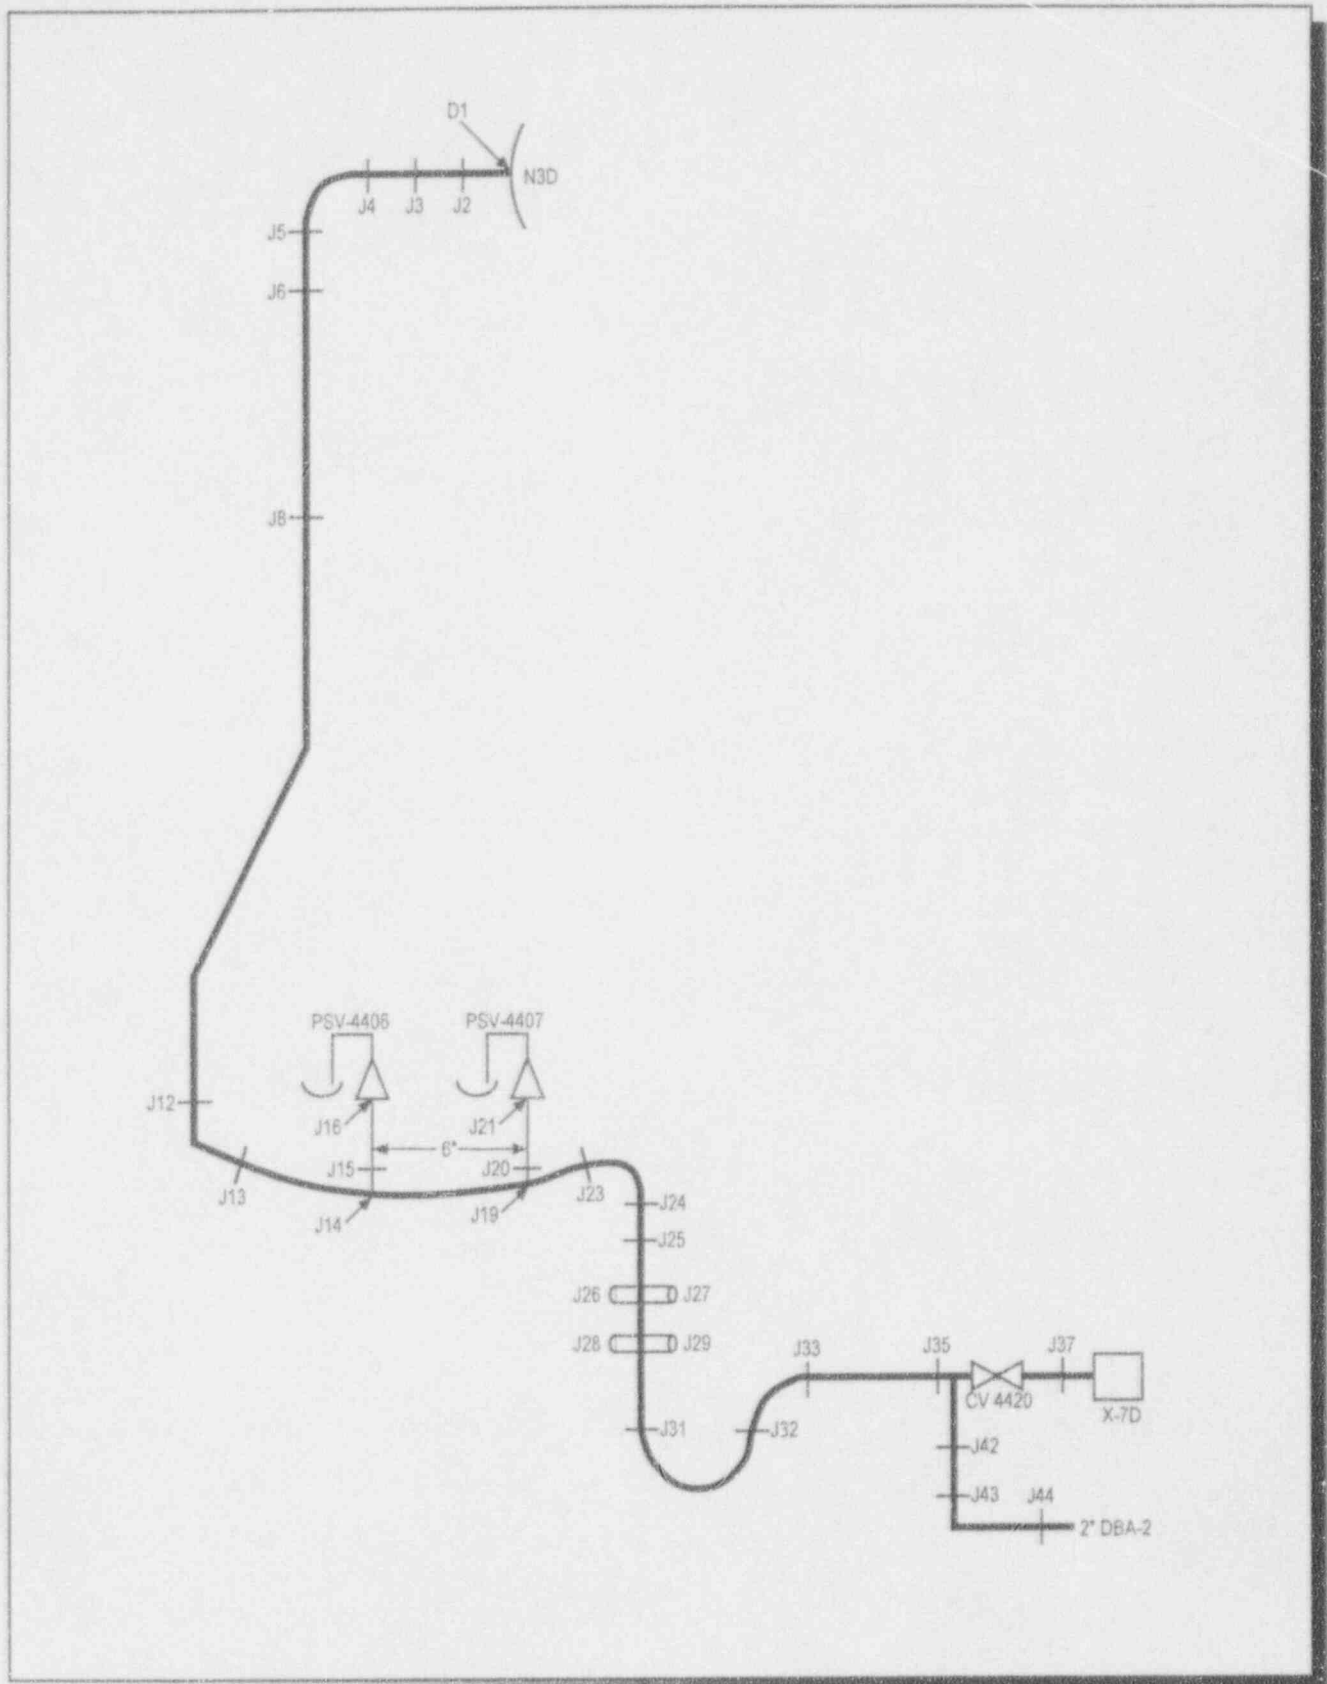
Isometric Drawing of Mainsteam Steam Line D
